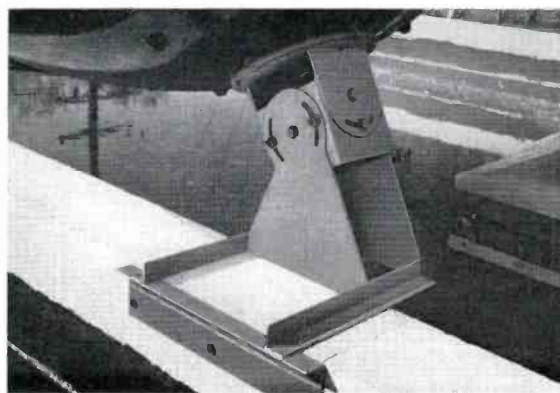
Close-up of special mount designed to fasten dishes on concrete beam of transmitter building roof. Note provision for universal adjustment.
